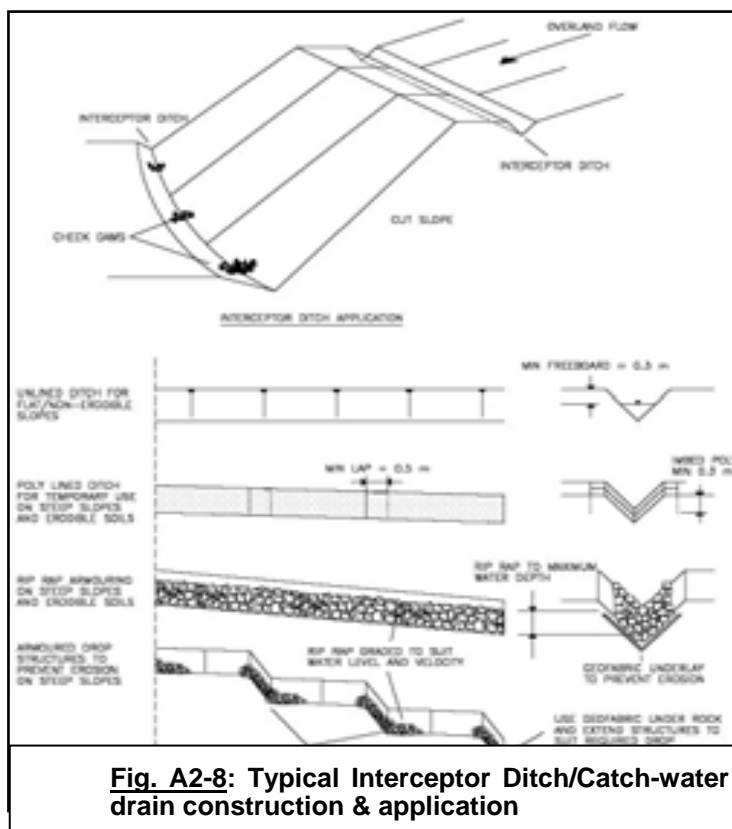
Typical Interceptor Ditch/Catch-water drain construction & application
